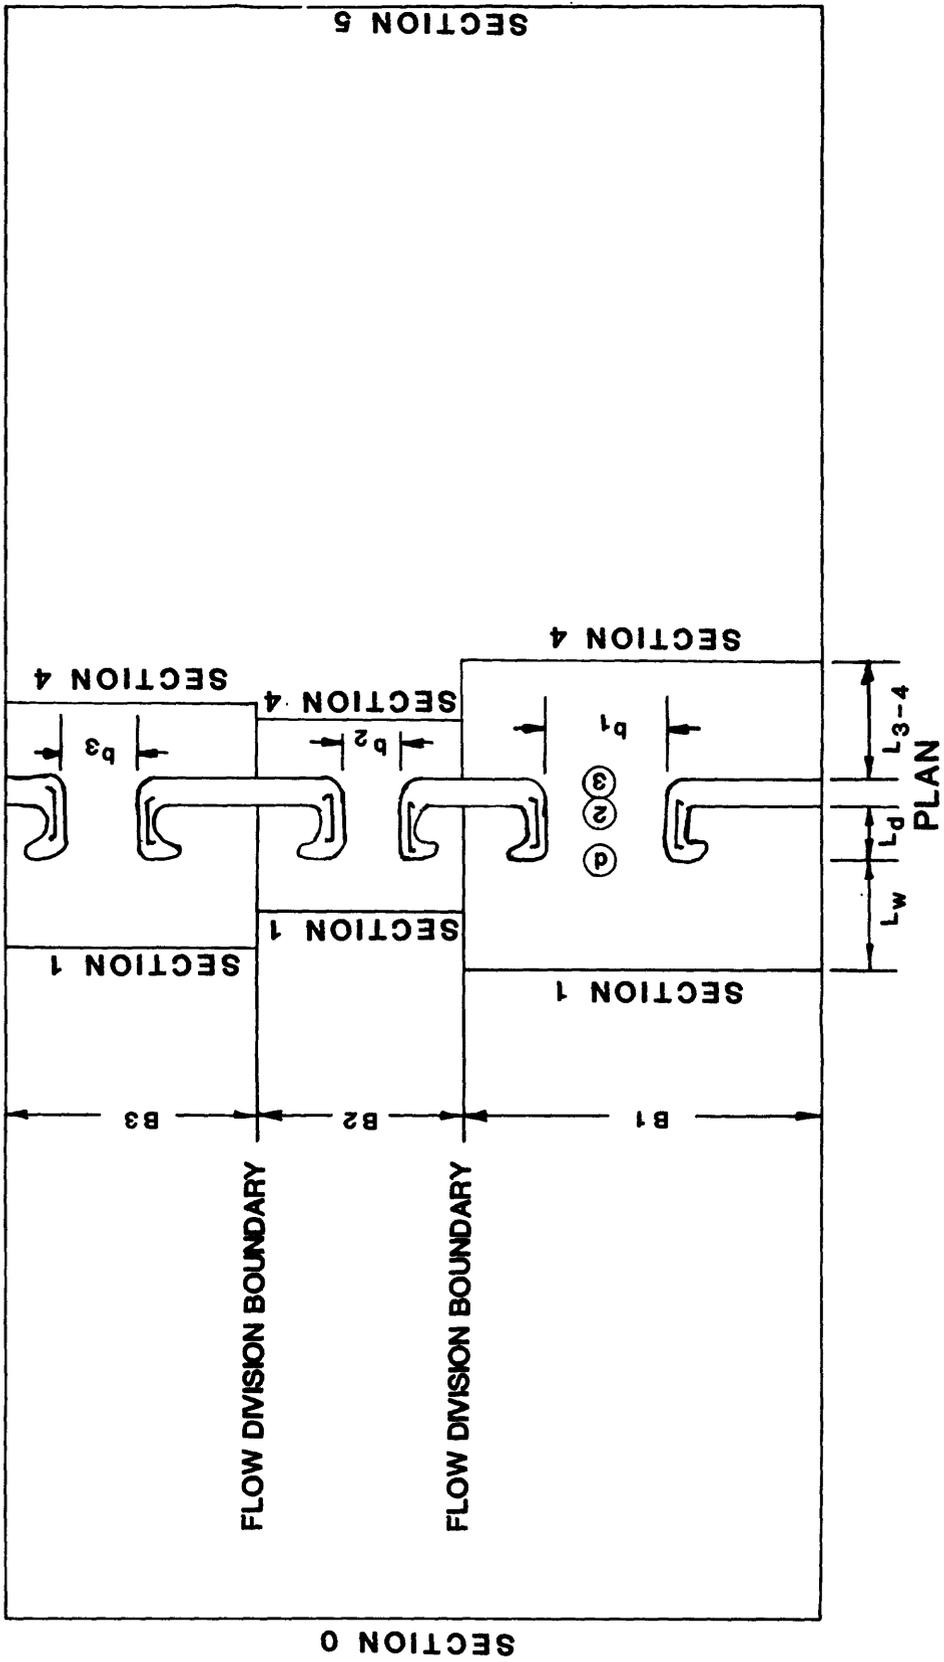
Definition sketch showing variables used in computing backwater and discharge at multiple-opening constriction.
